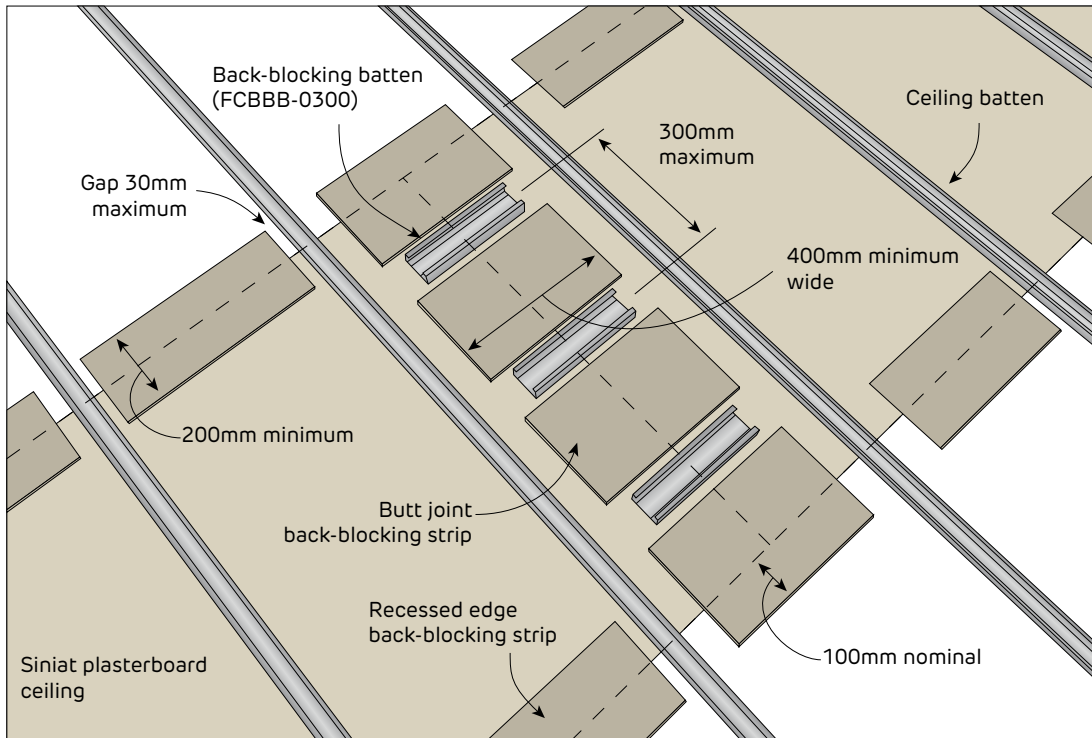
Placement of Back-Blocking Batten and Back-Blocking Strips for Recessed and Butt Joints
